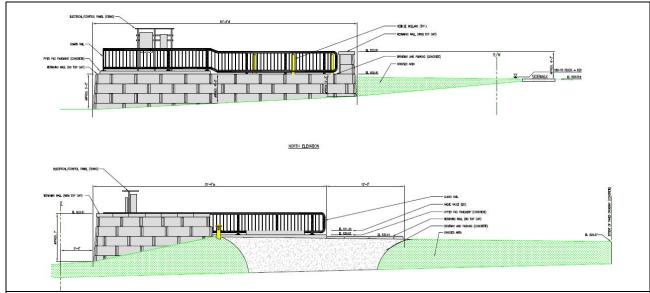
Elevation showing view from the north and the west (N Michigan St) of proposed elevated pump station.
